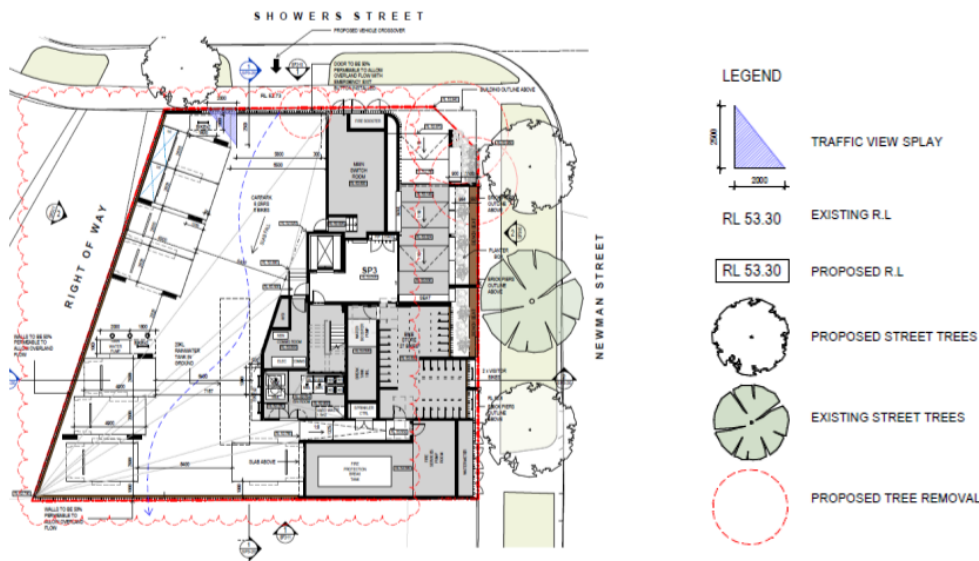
Proposed ground floor plan showing the location proposed tree planting locations (Source: Hayball Architects dated 29 November 2022).
